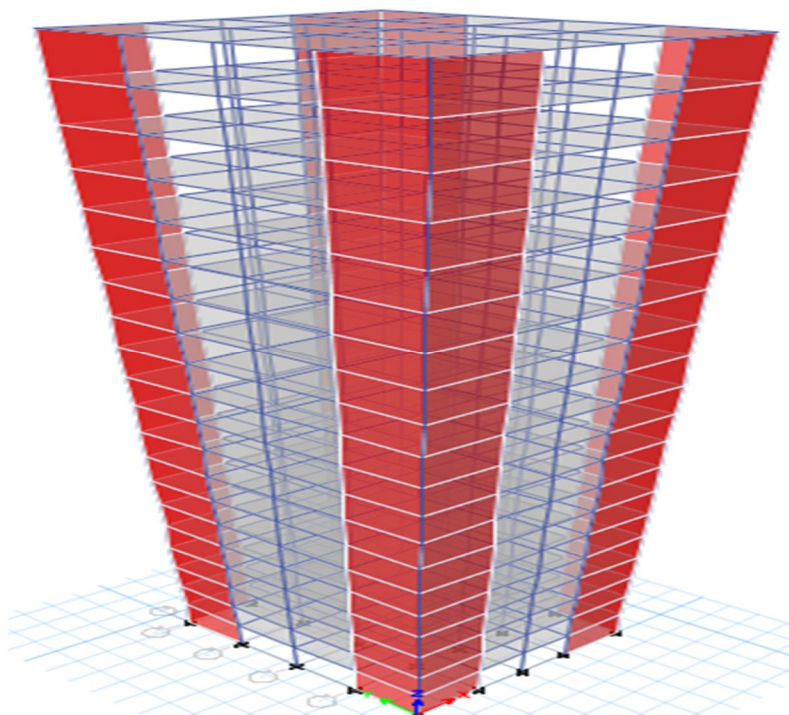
20 FLOOR BUILDING WITH SHEAR WALL
